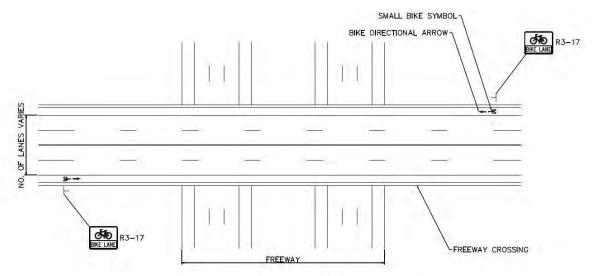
Plan View of Bike Lane Added to Existing Crossing
